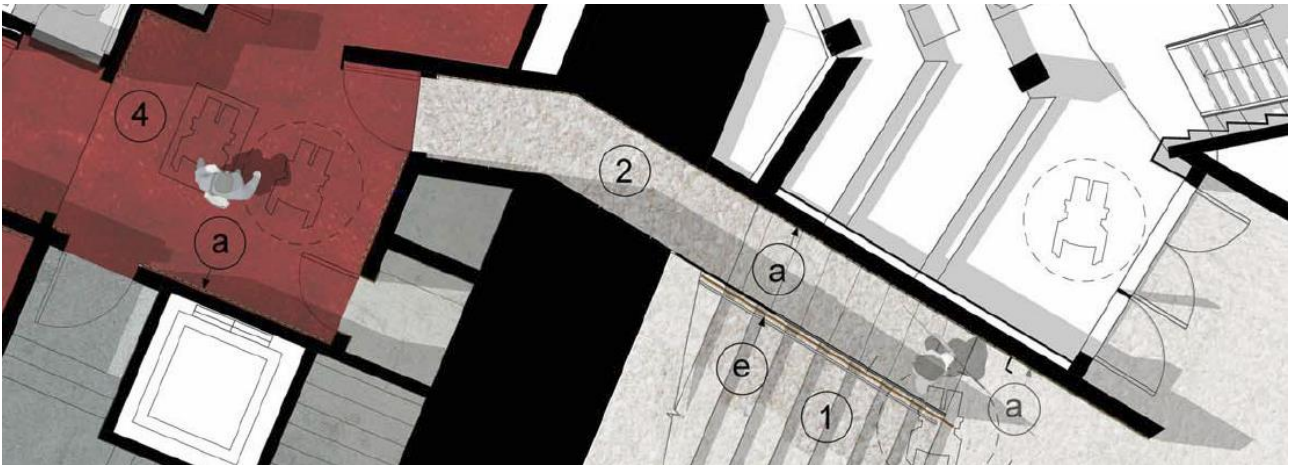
Extract from plan indicating Level 3 passage connection to Northern Foyer (49-VA-SC021\_DA240\_A)
